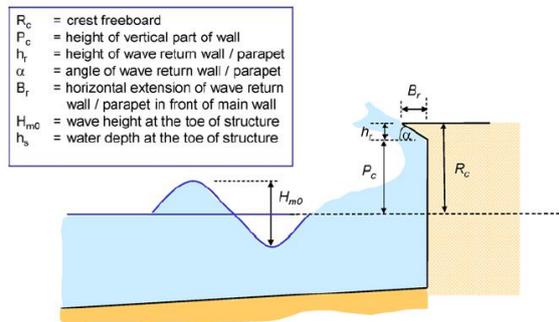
Parameter definitions for assessment of overtopping at structures with parapet/wave return wall.
